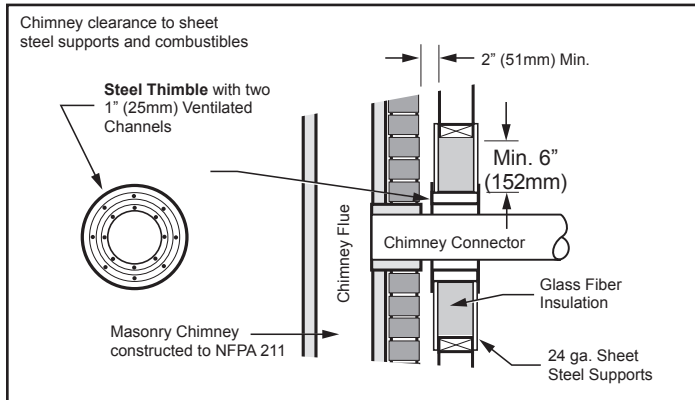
Wall Pass-through using single wall chimney connector with a ventilated steel thimble.
